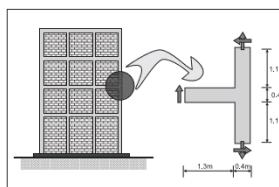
Exterior beam-column sub-assembly of an RC frame building, geometry and forces acting on it when it swings from right to left
